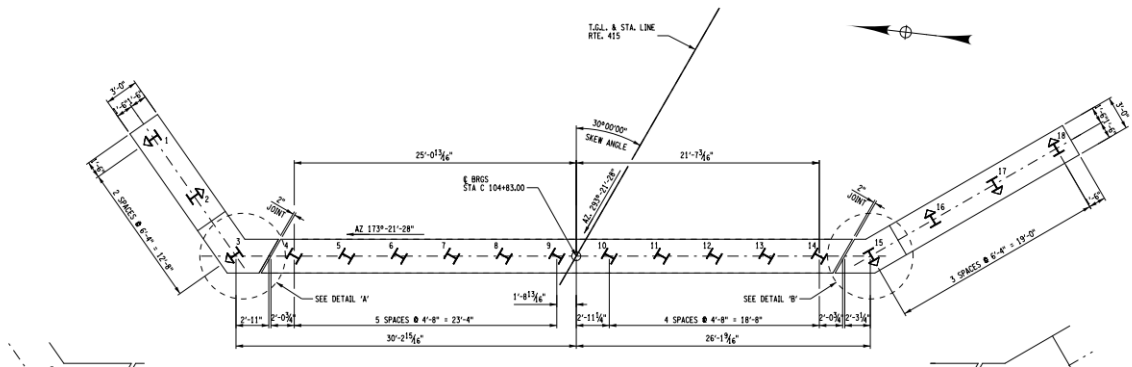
Pile layout at beginning abutment of NY Route 415 bridge over Meads Creek
